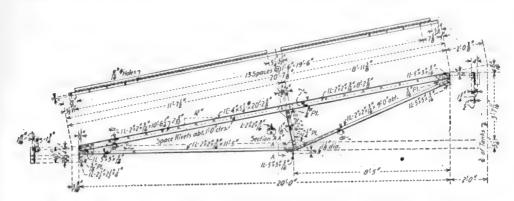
DETAILS OF STEEL ROOF TRUSS FOR STEEL BINS, INDEPENDENT ELEVATOR.
